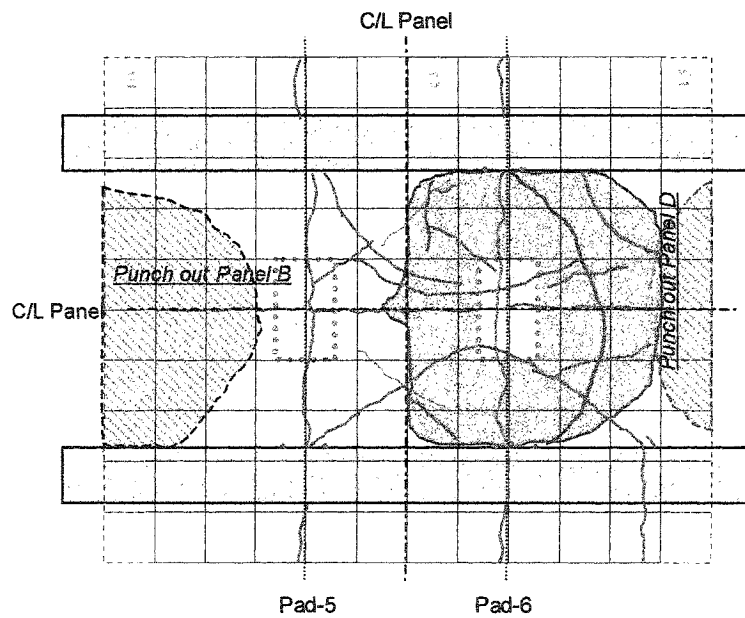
Panel-C: Crack Pattern on Soffit after Failure
